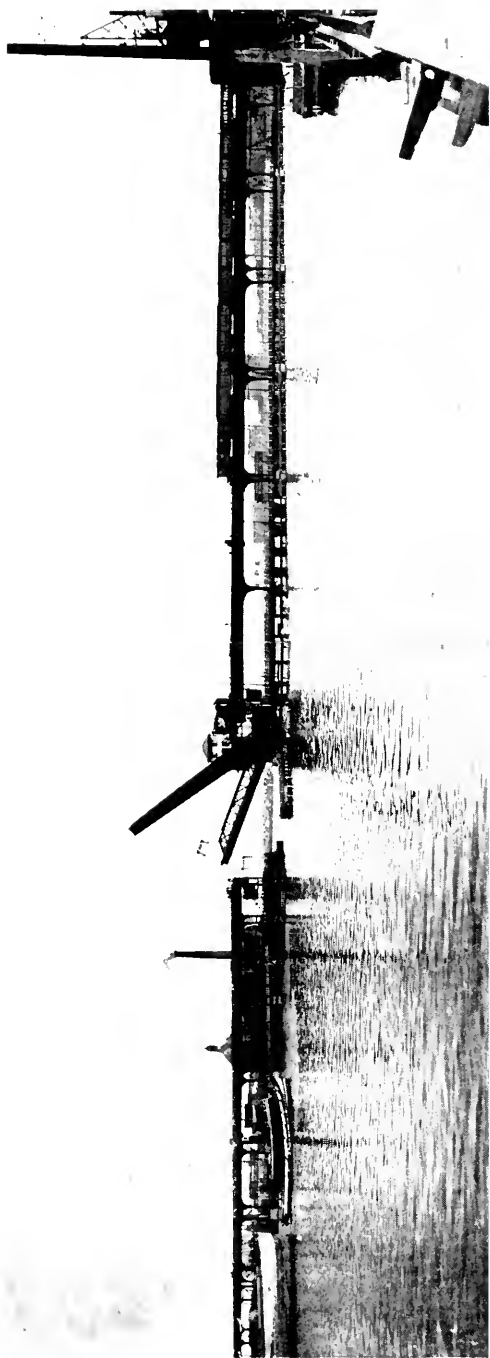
GENERAL VIEW OF BRIDGE AND VIADUCT.
